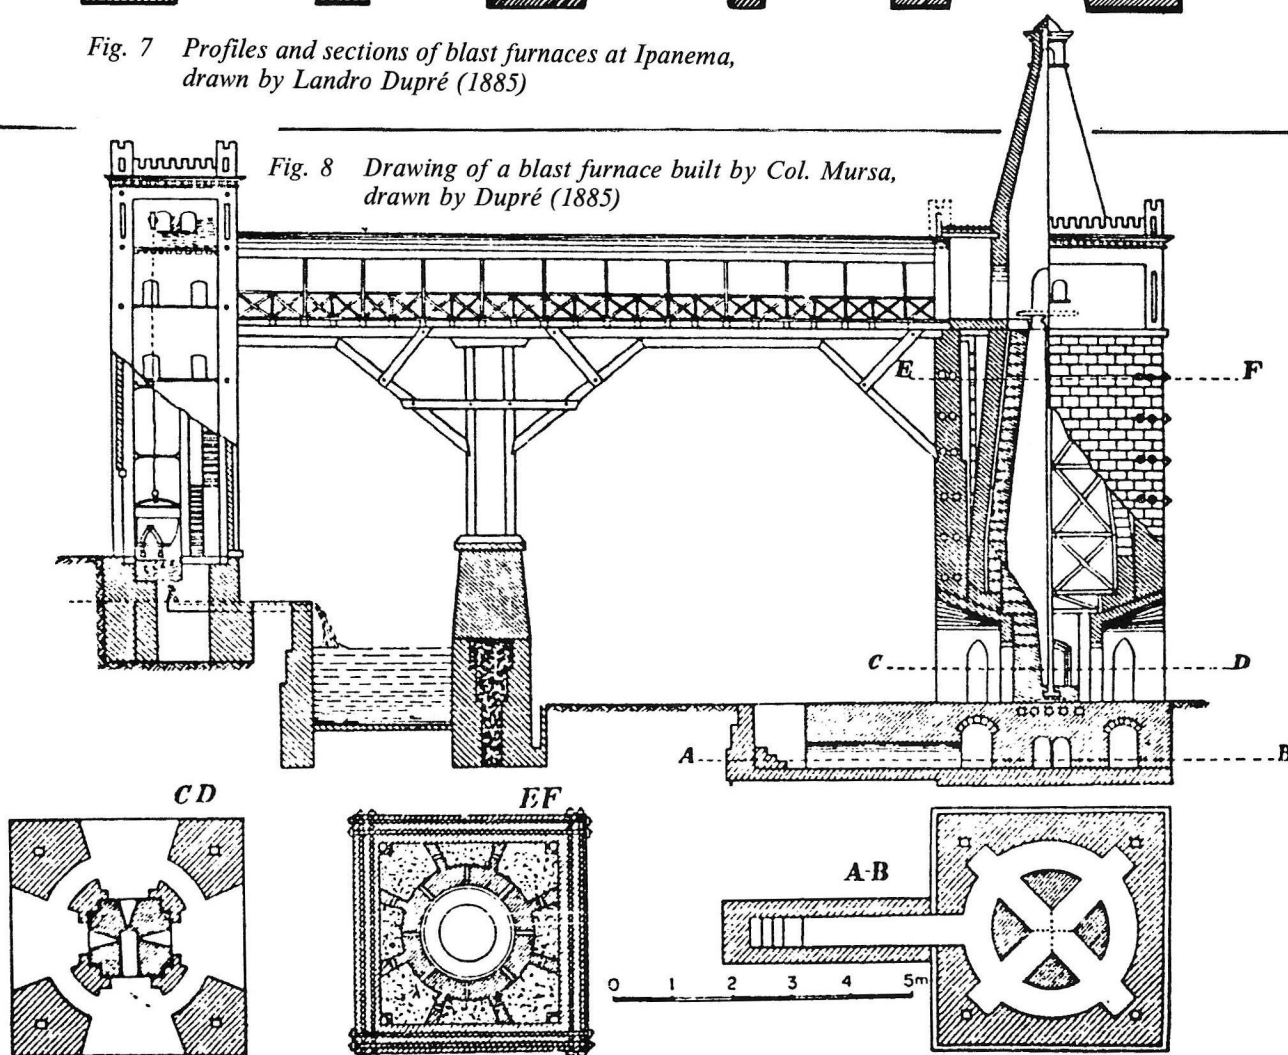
Drawing of a blast furnace built by Col. Mursa, drawn by Dupré (1885)
